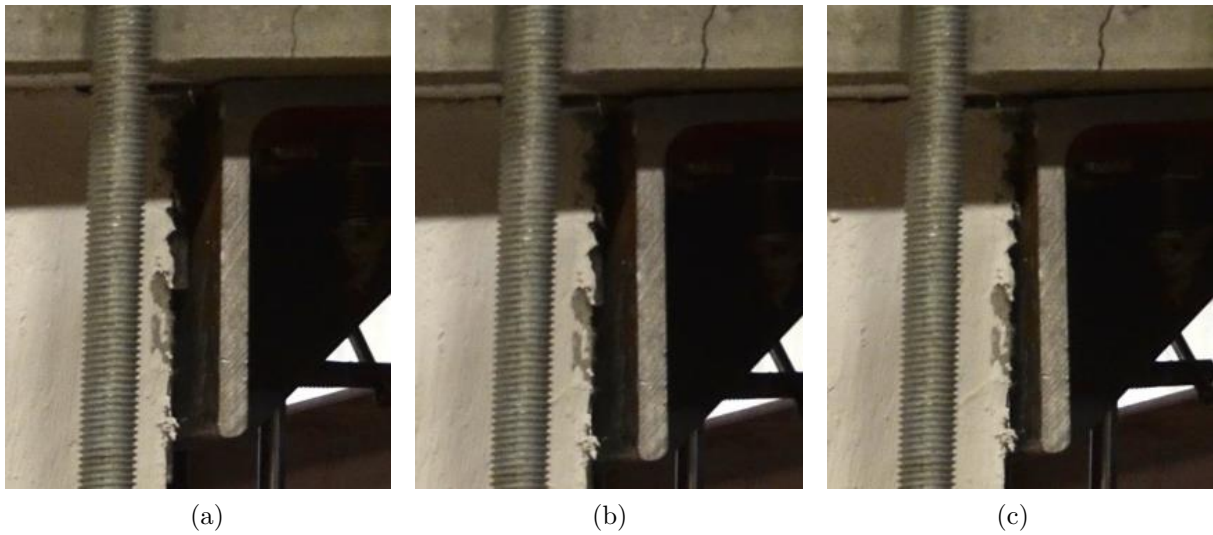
SW-220-15-2 focused on top right corner (a) before SHCC cracking (b) Localized SHCC crack formed (c) Corner debonded and localized cracked open wider
